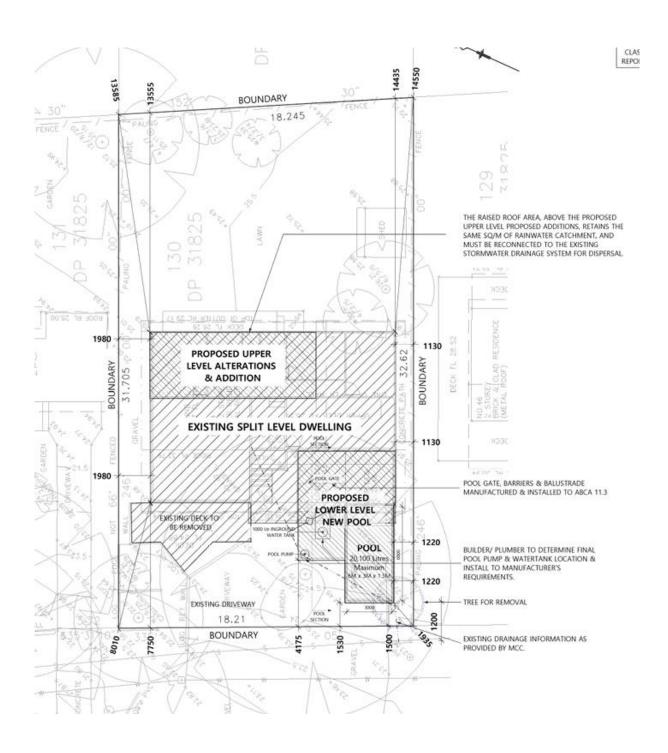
Extract of Site Plan (Source: Cinz & JB 3D Drafting & Design)
